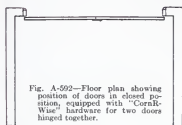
Floor plan showing position of doors in closed position, equipped with "CornR-Wise" hardware for two doors hinged together.
